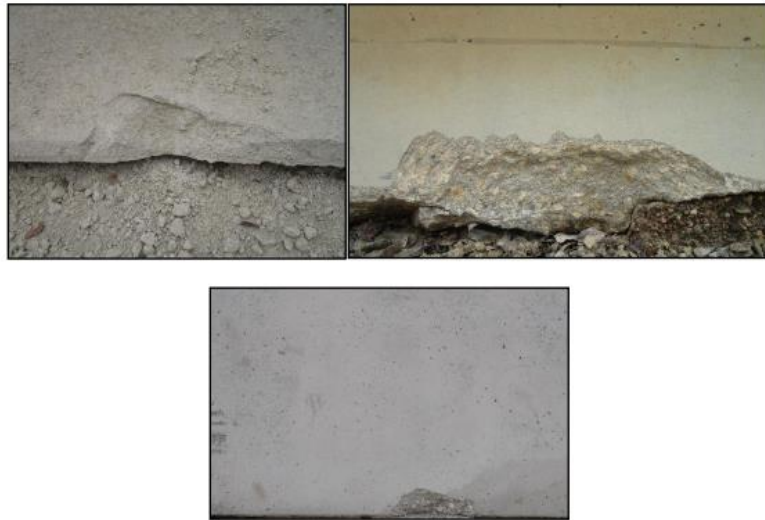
Acceptable Barrier—Spall Projects toward Traffic by Less than 30 Degrees.
